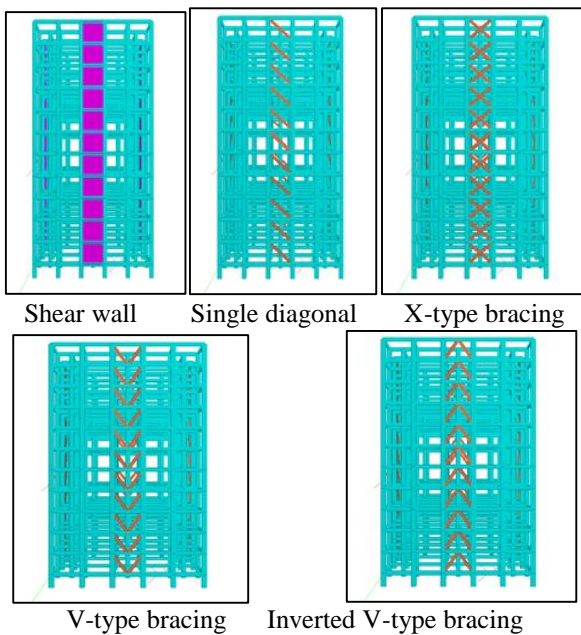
Elevation of G+10 storey building using different types of bracing pattern & shear wall used in middle position.
